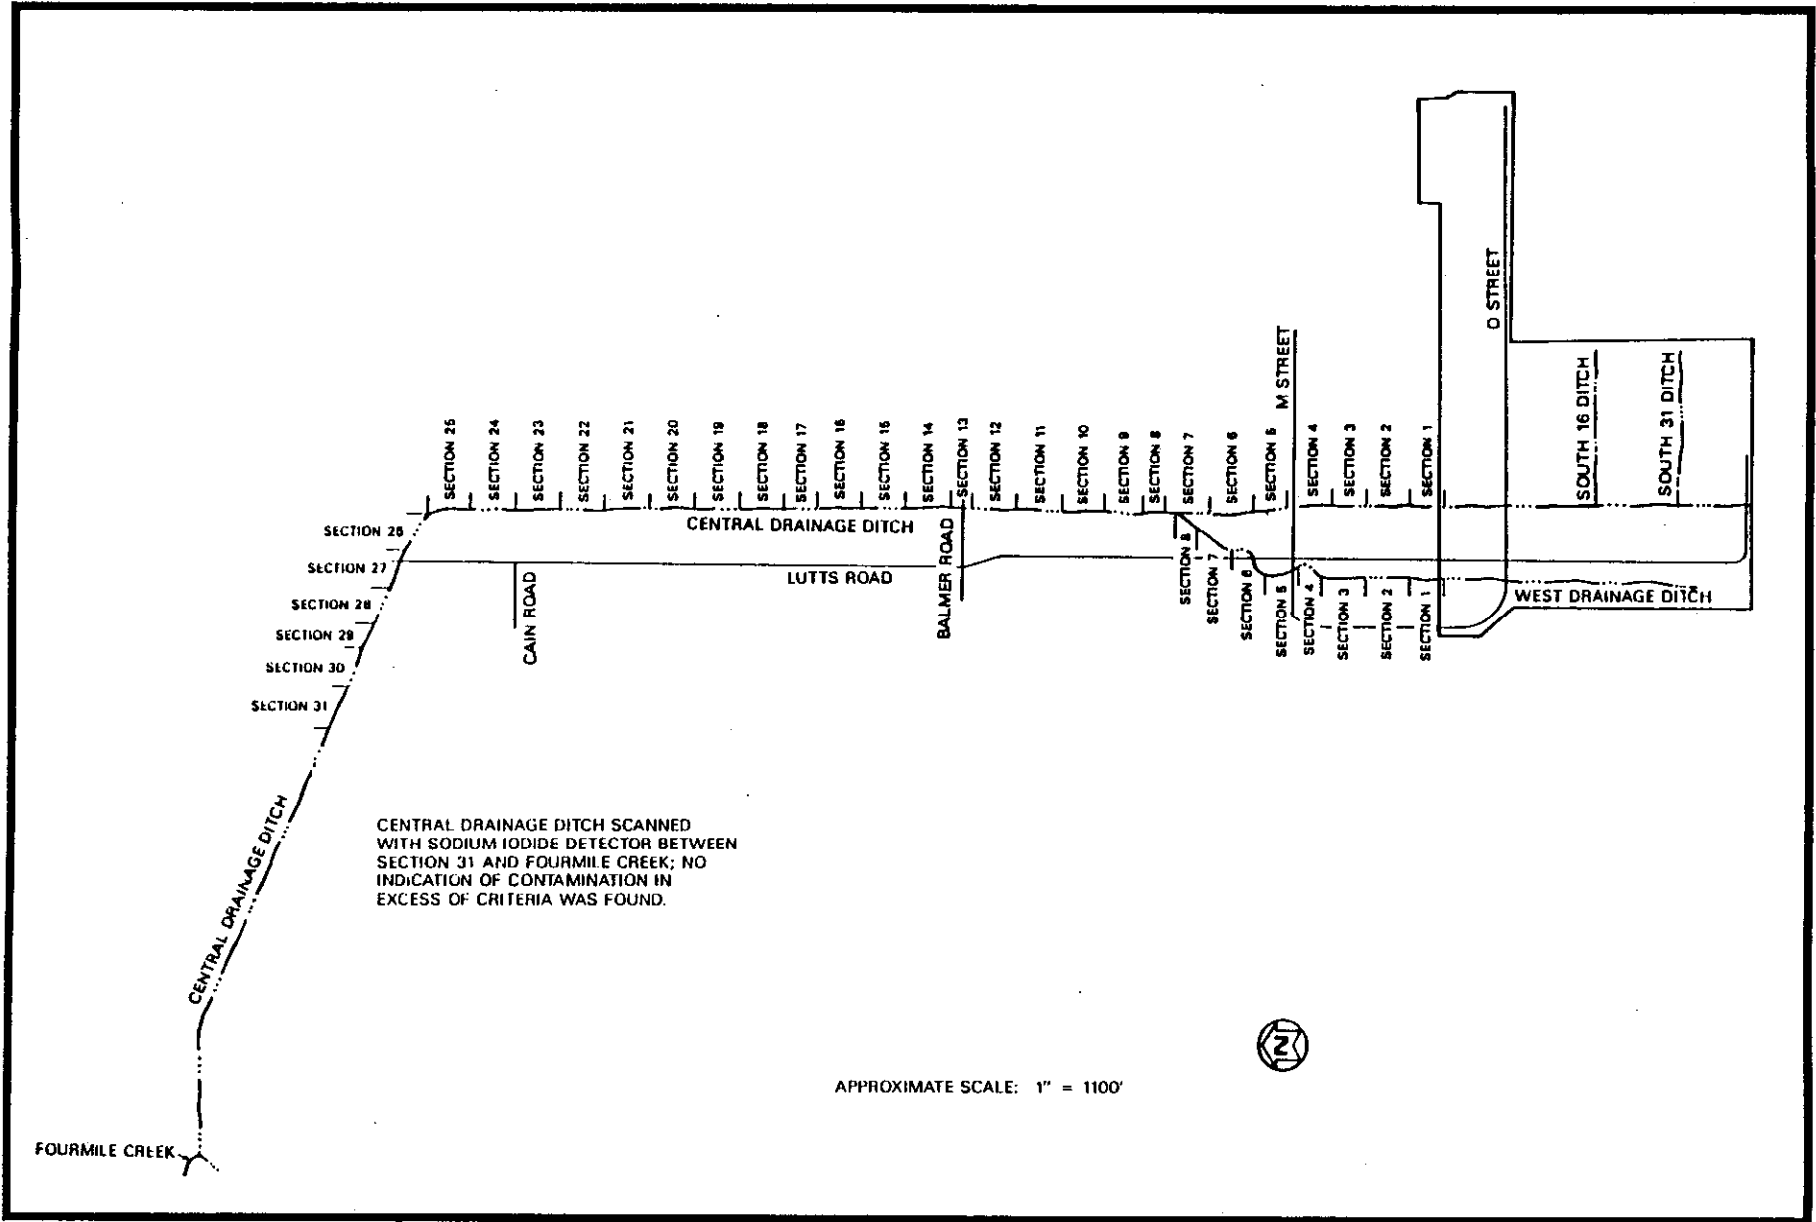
LOCATION AND REFERENCE DRAWING FOR THE WEST AND CENTRAL DRAINAGE DITCH EXCAVATIONS
